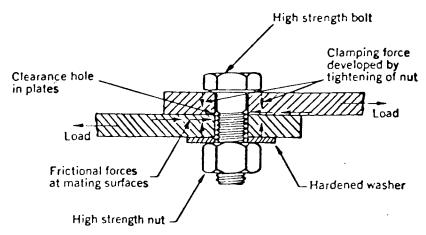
Friction joint with a hexagon-head high-strength bolt in a clearance hole.
